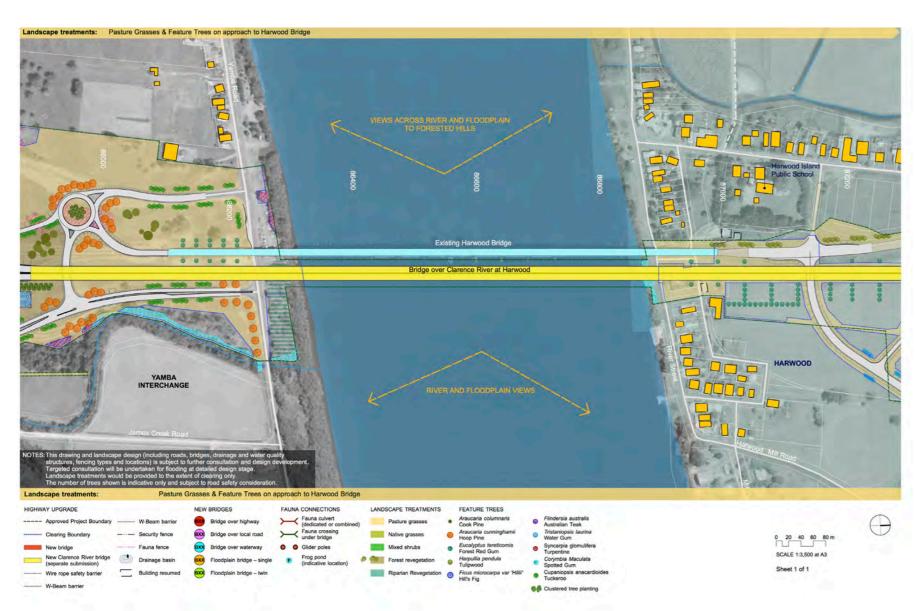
Landscape design plan for the bridge over Clarence River at Harwood (refer to Chapter 8).
